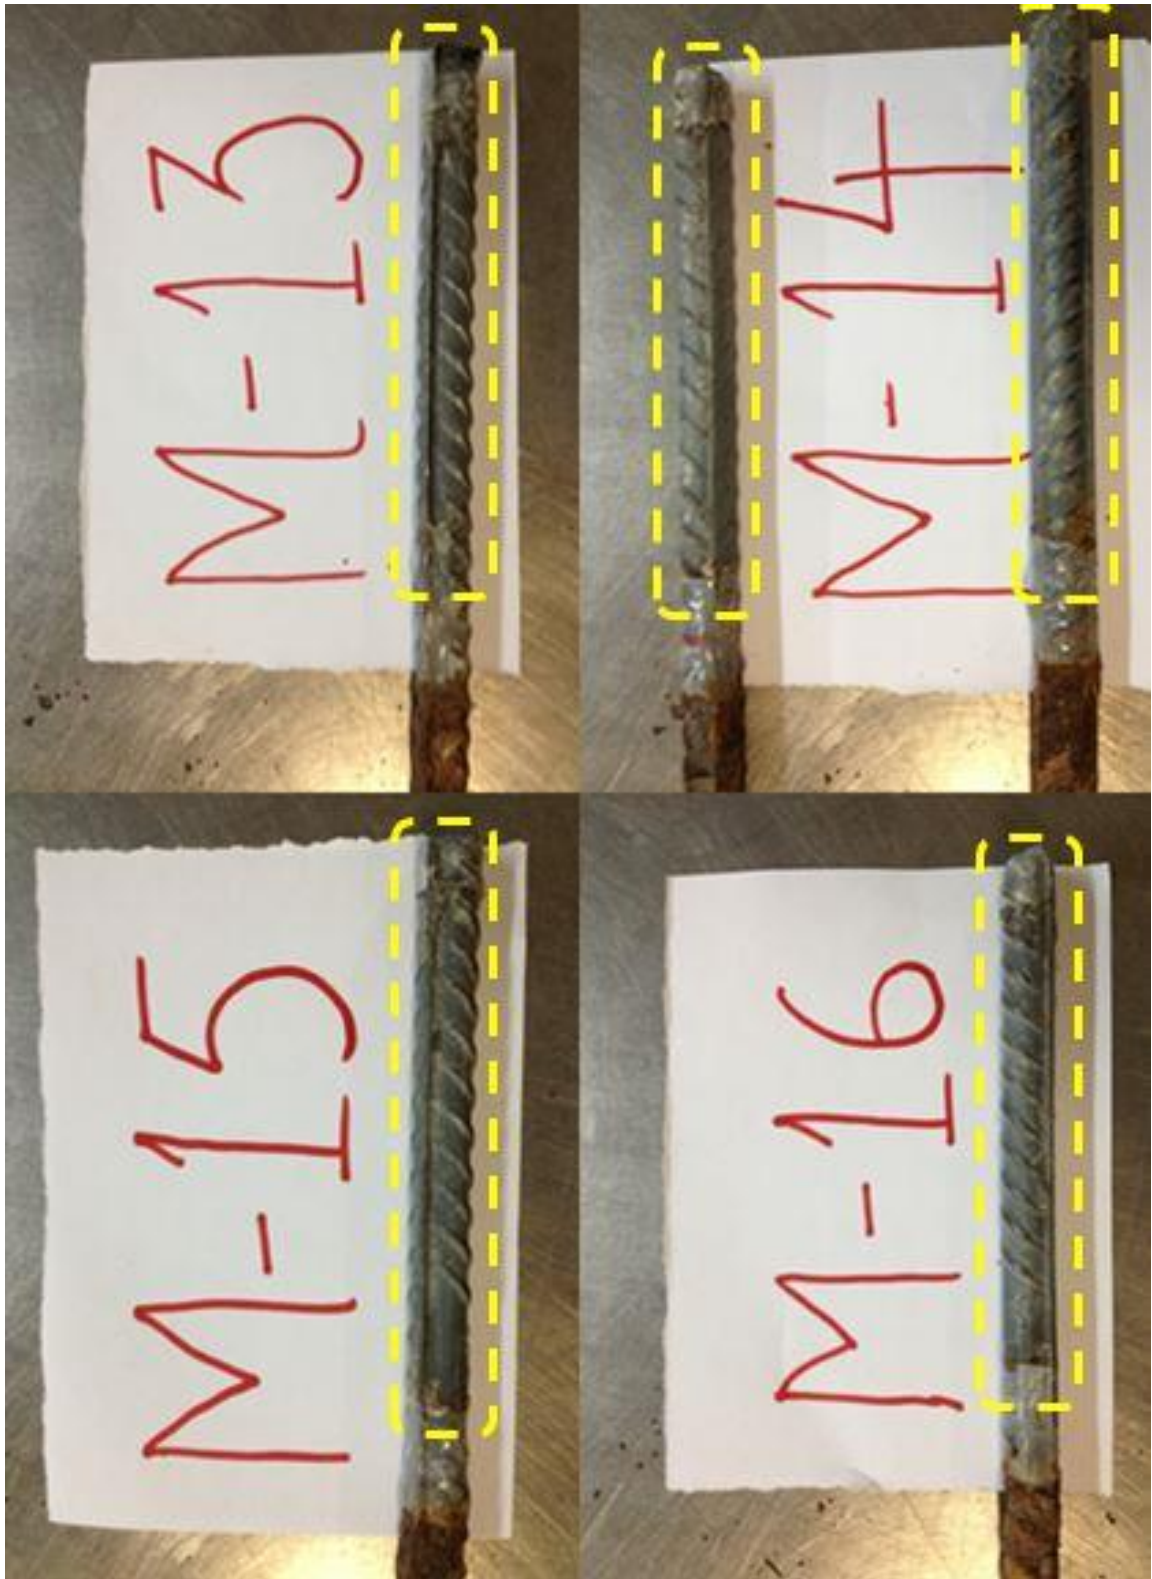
Highlighted portion of the rebar was embedded in concrete (Mixes no.5 to 8)
